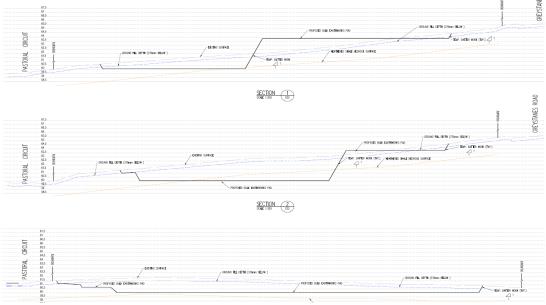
Bulk Earthworks Section Plan - prepared by TTW
